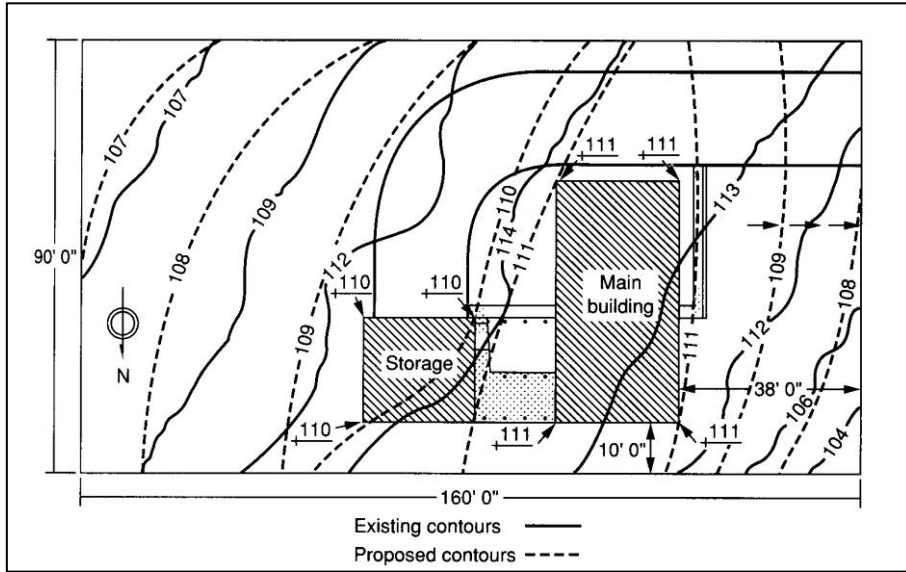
B The Site Topography Plan. (Source: Construction Administration : n.d.)
